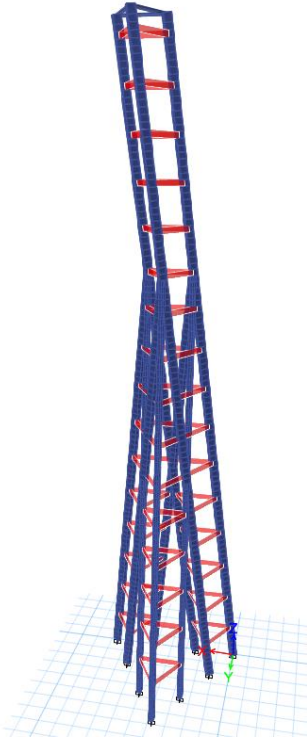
3 Mega columns with belt wall, 450 m high
